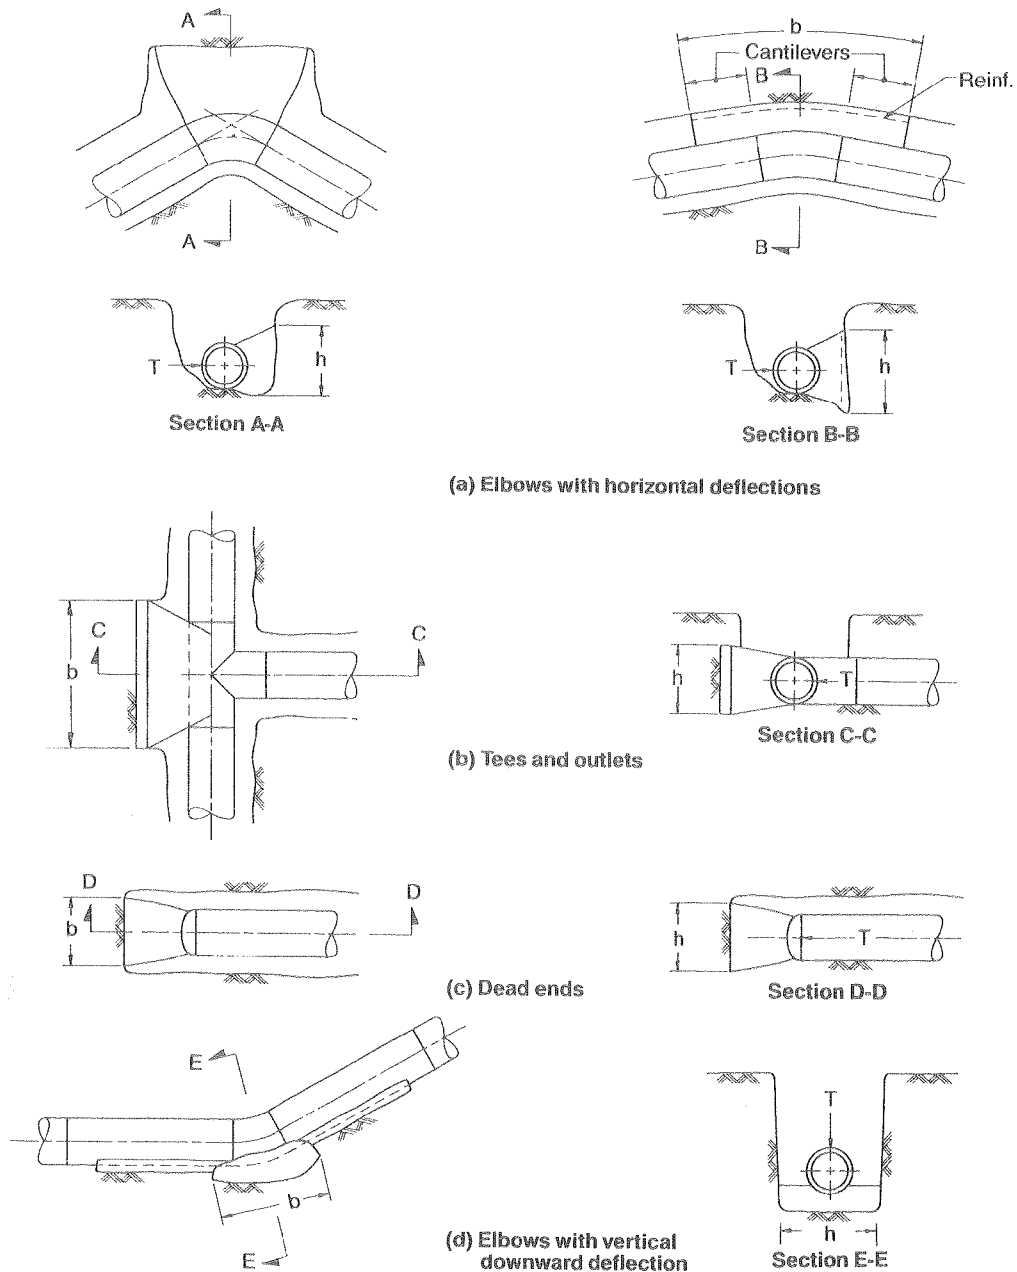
BEARING TYPE THRUST BLOCKS FOR TYPICAL FITTINGS. Unreinforced concrete thrust blocks should not extend beyond the joints of fittings. Where the extension is necessary, the two pipe sections adjacent to the fitting should be concrete
